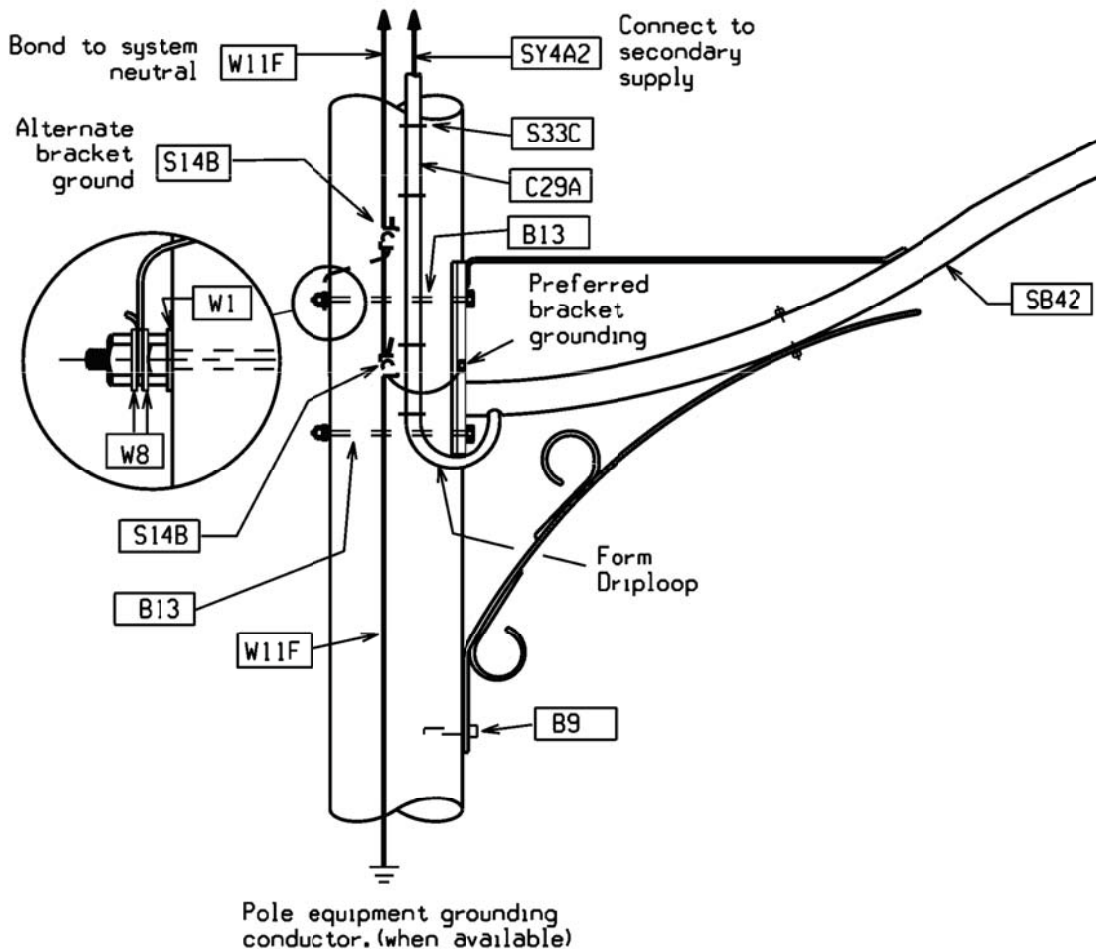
Teardrop Luminaire Installation on Wood Pole
